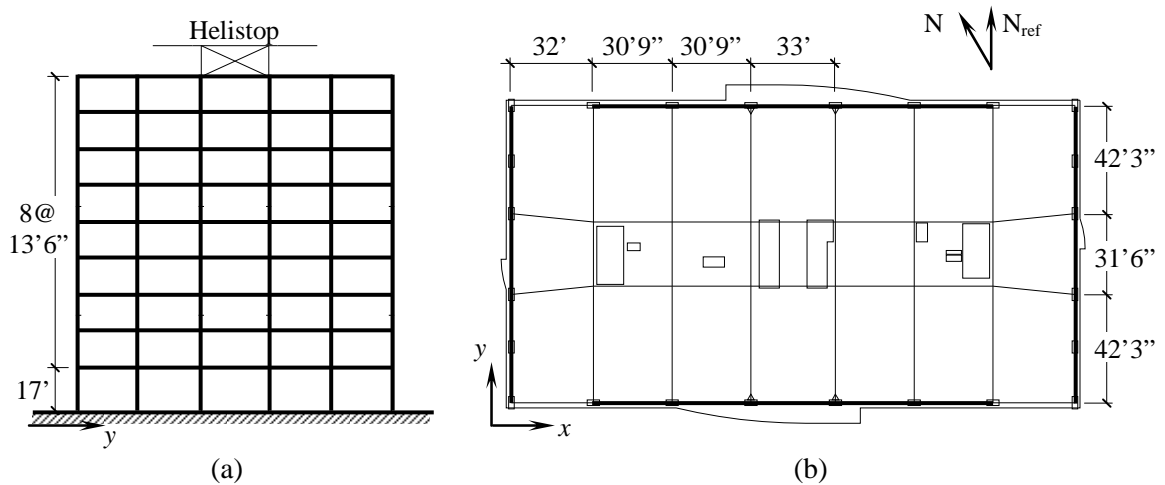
(a) West elevation; (b) typical floor plan of the selected 9-story symmetric-plan building.
